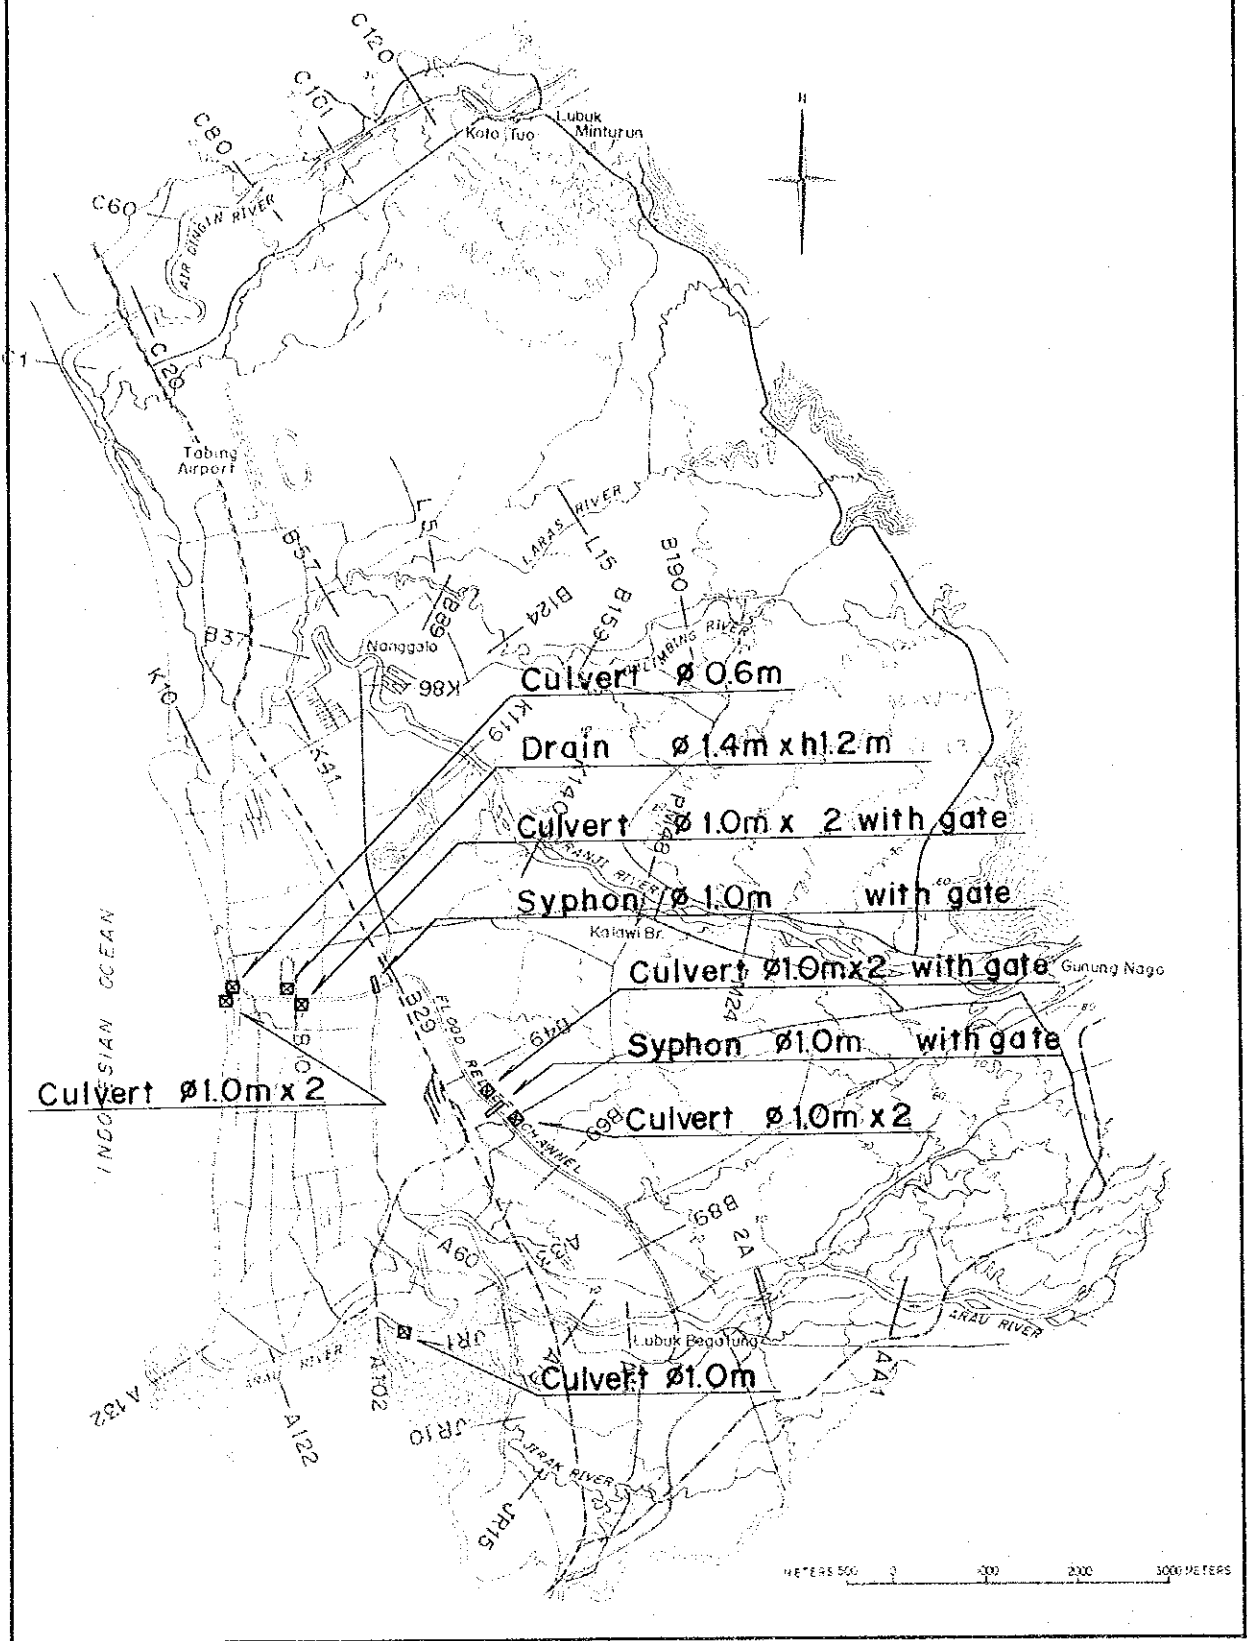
General Layout of Comprehensive Plan for Urban Drainage
